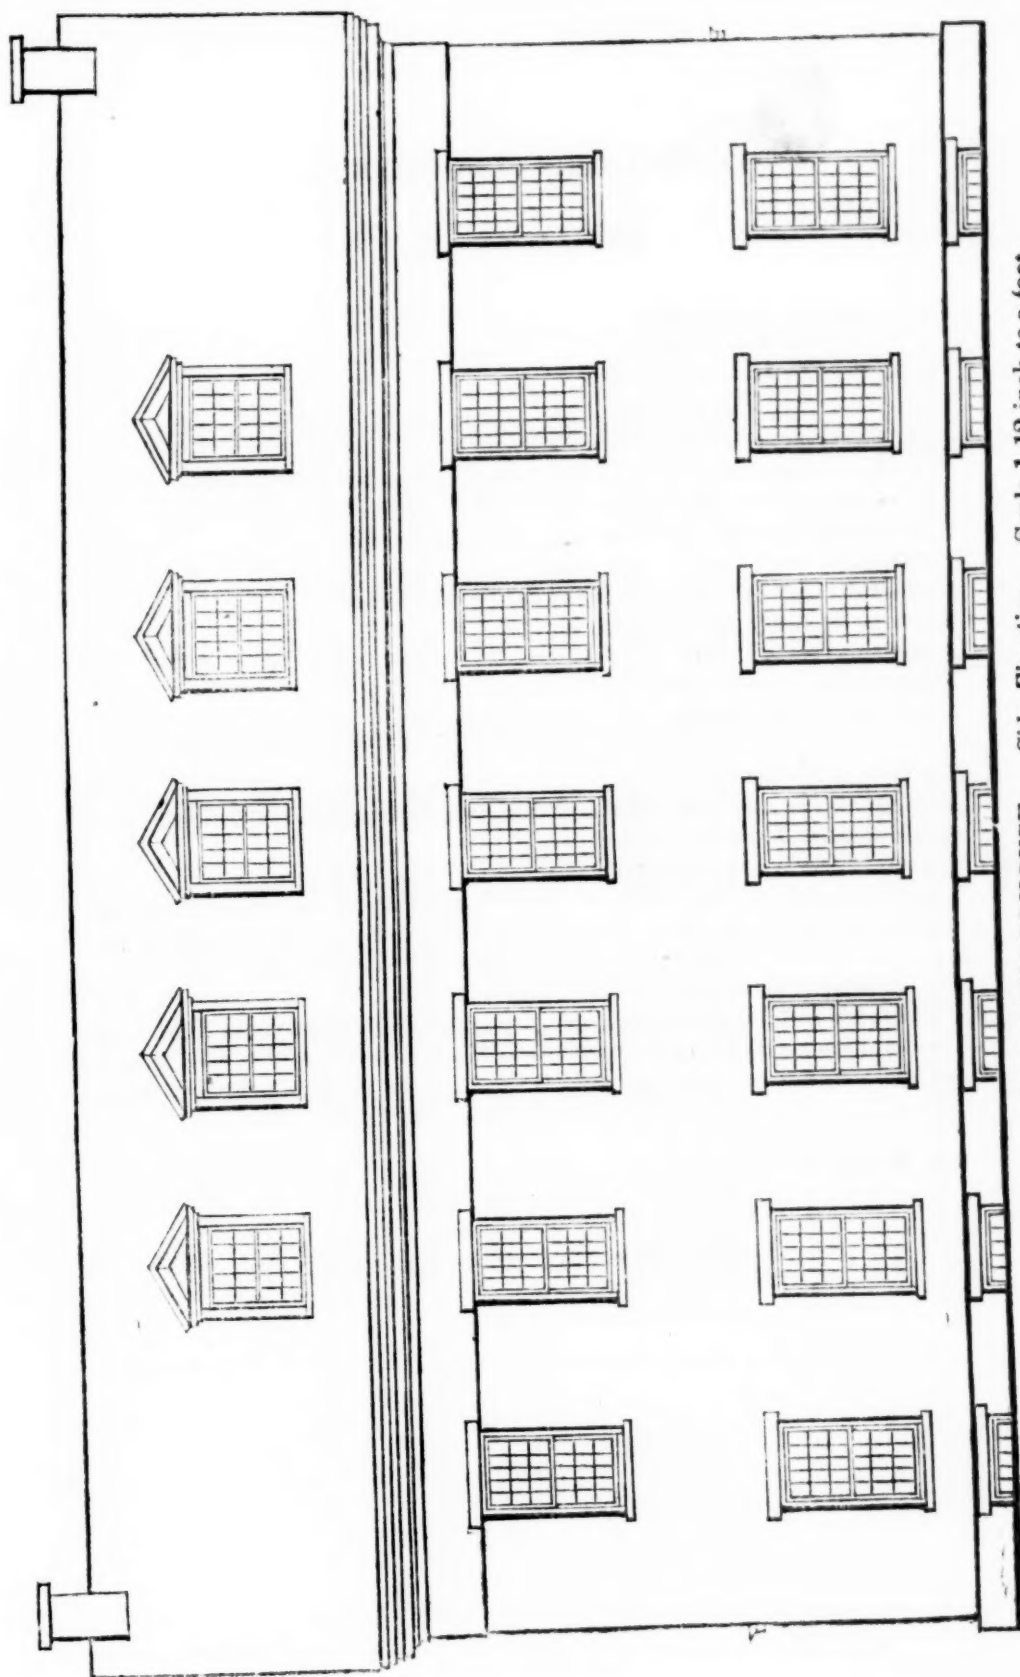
LOWELL HIGH SCHOOLHOUSE. Side Elevation. Scale 1-12 inch to a foot.
